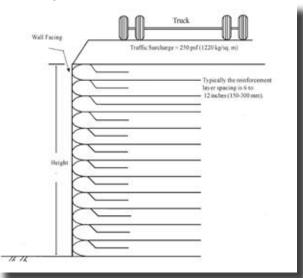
Design drawings of a geotextile wall (adapted from Wu 1994).
